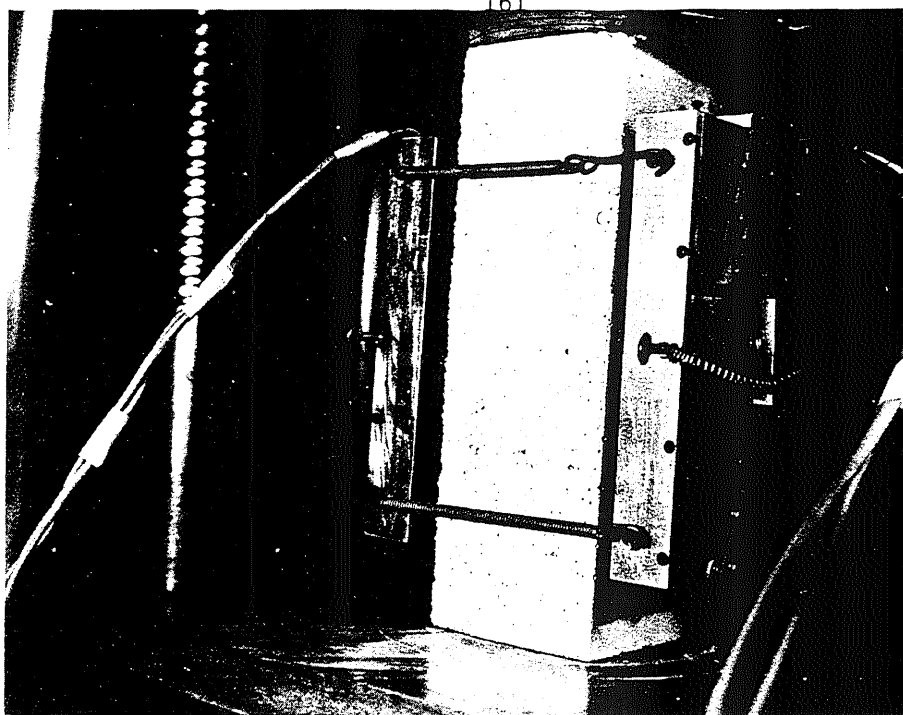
VIEW OF CLIP GAUGES MOUNTED ON A CONCRETE PRISM AND PLACED IN HYDRAULIC TESTING MACHINE
